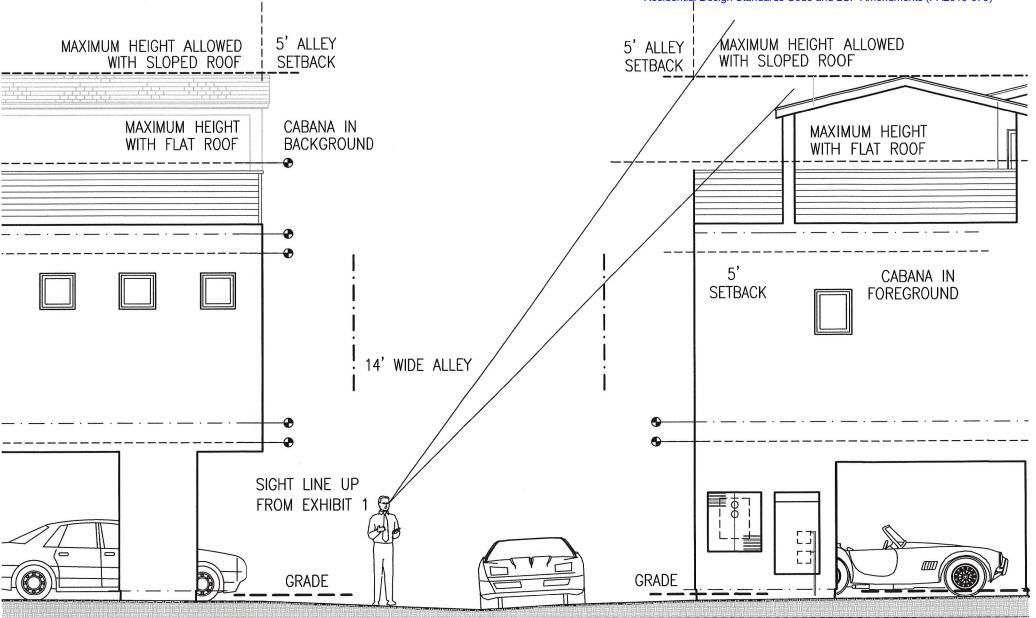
LIMIT LOCATION SIDE ELEVATION 3/16"
